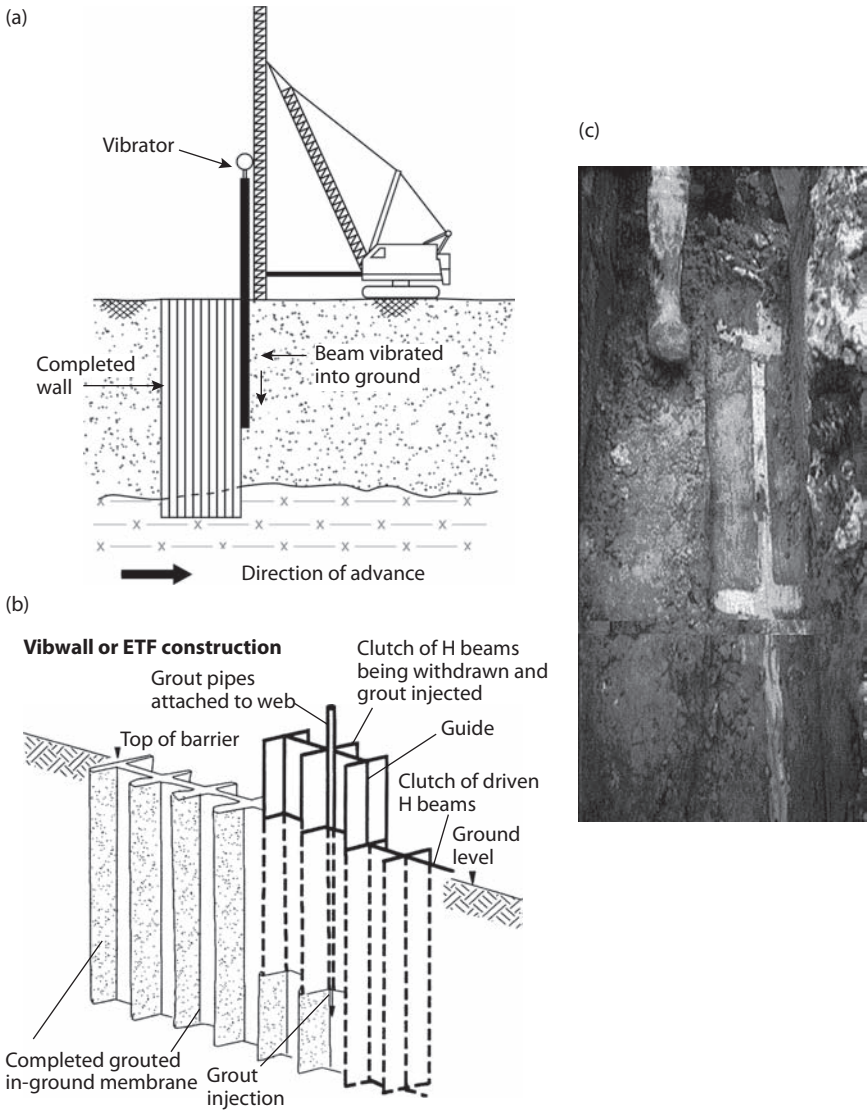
Construction sequence for vibrated beam cutoff walls. (a) Installation sequence for vibrated beam cutoff walls. (b) Schematic detail of vibrated beam cutoff walls. (From page 62 of Woodward, J., *An Introduction to Geotechnical Processes*, Spon Press, London, 2005. With permission.) (c) Exposure of vibrated beam wall during excavation. (Courtesy of Bachy Soletanche, Burscough, U.K.)
